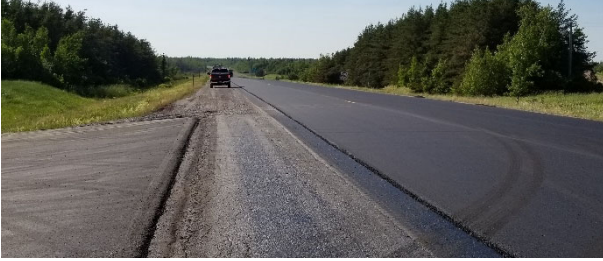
Looking north (to the left) on Route 15 from the Site Access toward Acadie Road
